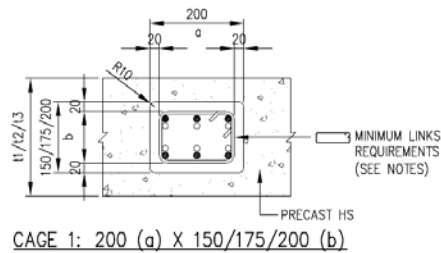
DETAILS OF REINFORCEMENT BARS NEAR DOOR FRAME AND AT ELECTRICAL FIXTURES ON INTERNAL FACE OF PRECAST HS
